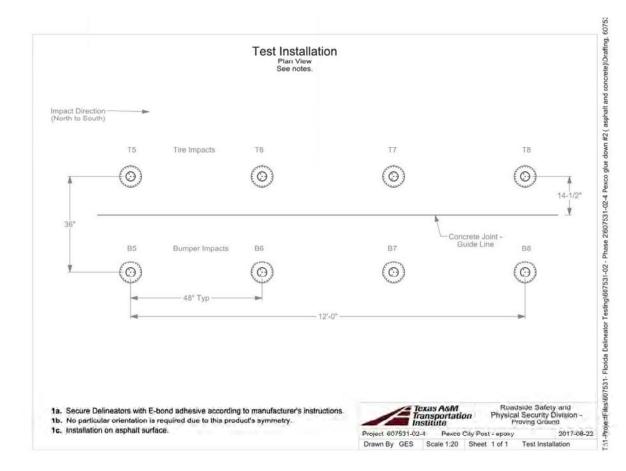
607531-02-4 Test Setup Details on Asphalt Surface.
